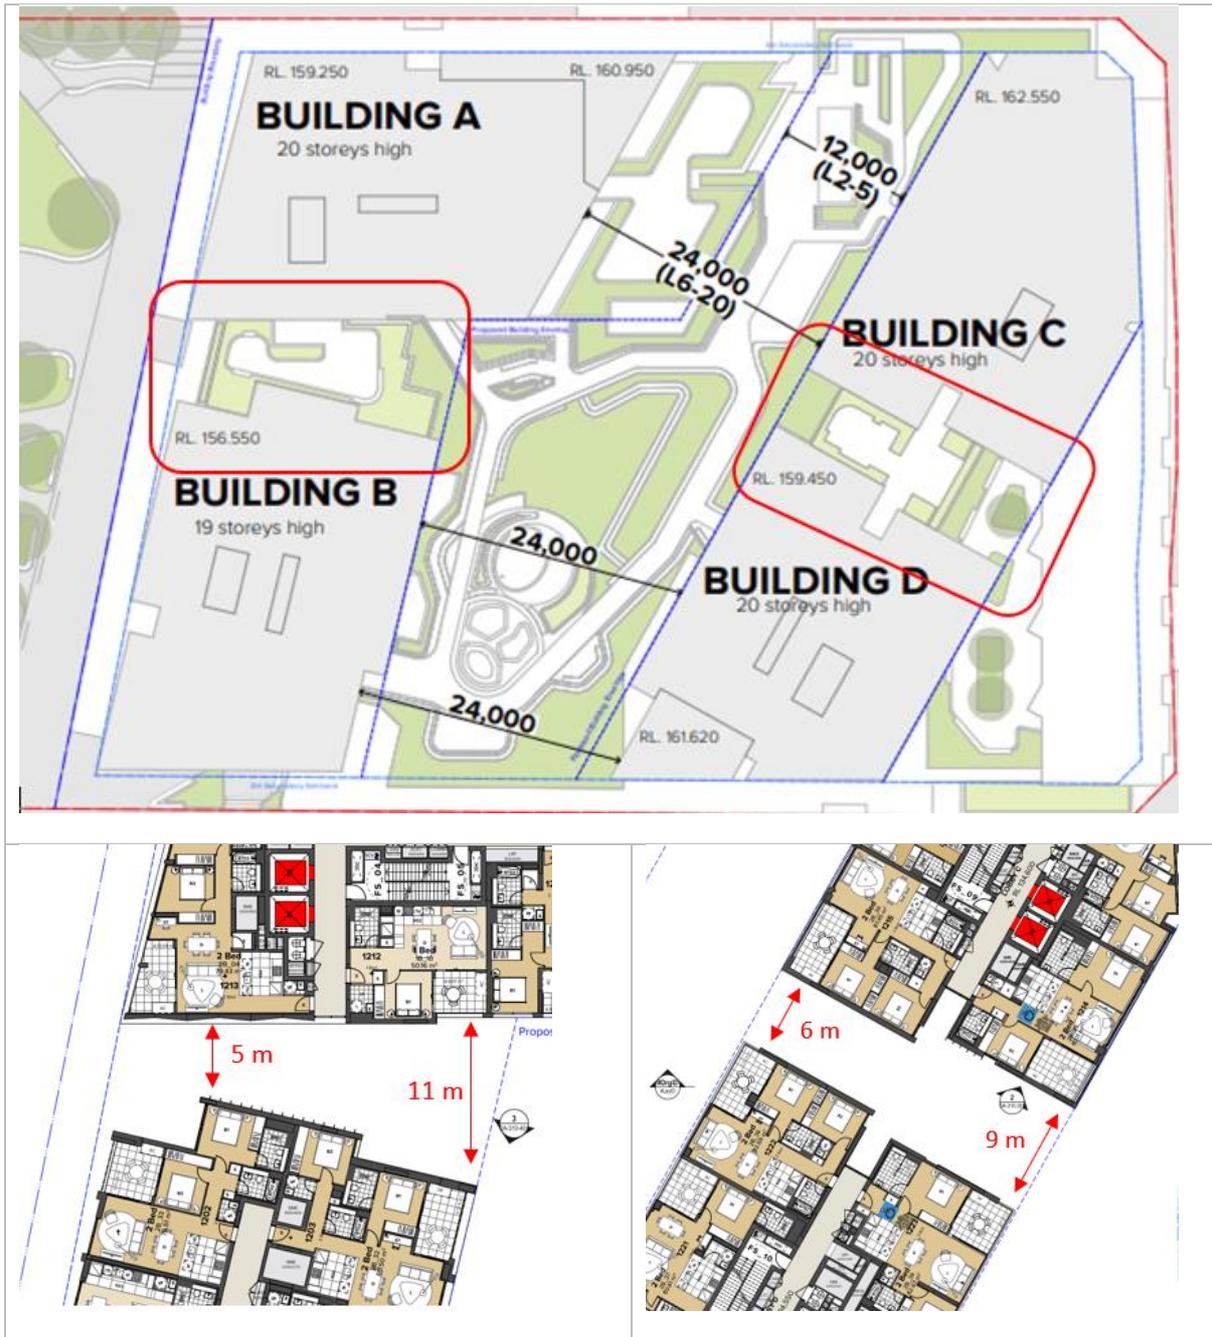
| Building separation across podium communal open space (above) and visual privacy between internal elevations of Building A and Building B (below left) and between Building C and D (below right) (Source: RtS)
